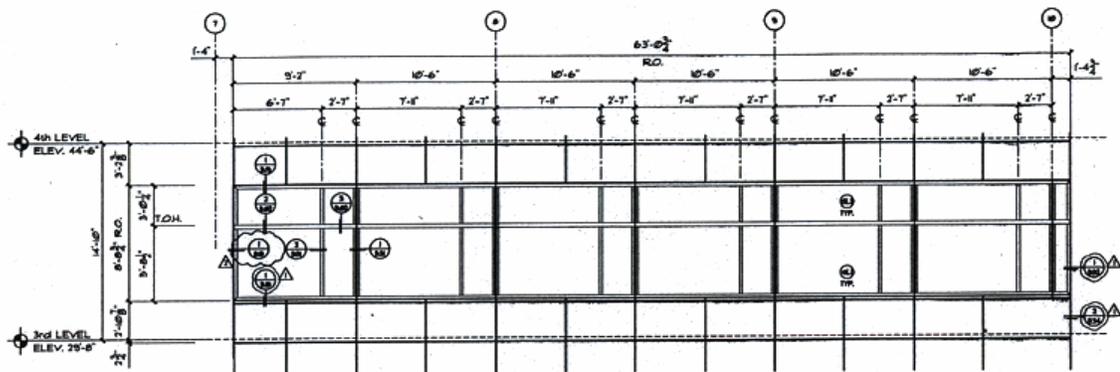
Shop Drawing of Punched Window Wall containing Stone Panels, Insulating Glass Units, and Aluminum Extrusions (Walters & Wolf 2003)
